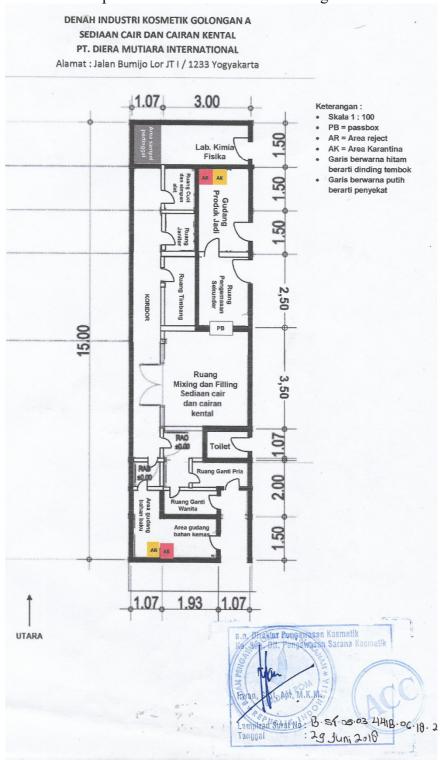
Floor Plan of Cosmetic Industry Group A liquid preparations and viscous liquids in the era of Mutiara International
